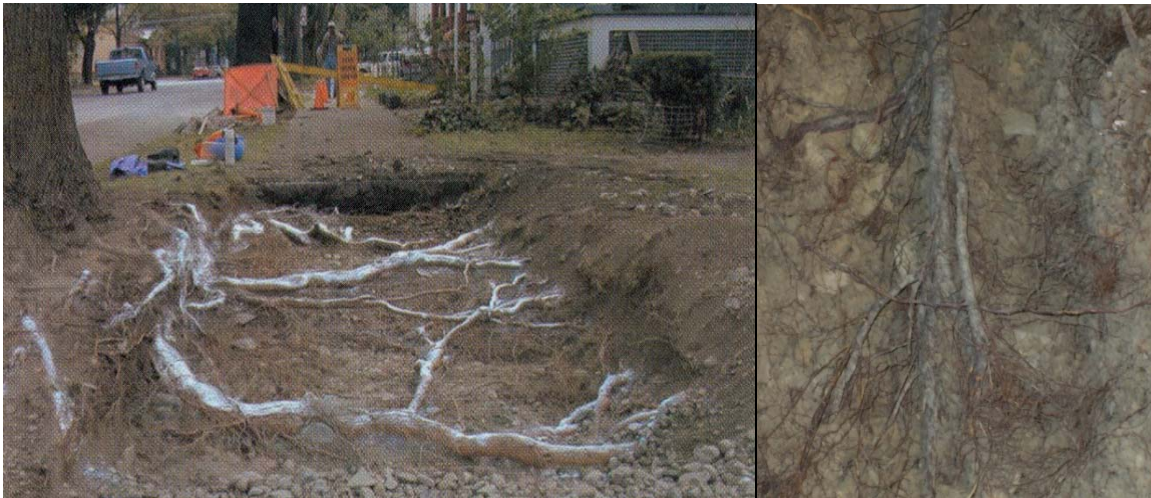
Air Excavated Roots (Bassuk et al, 9)
